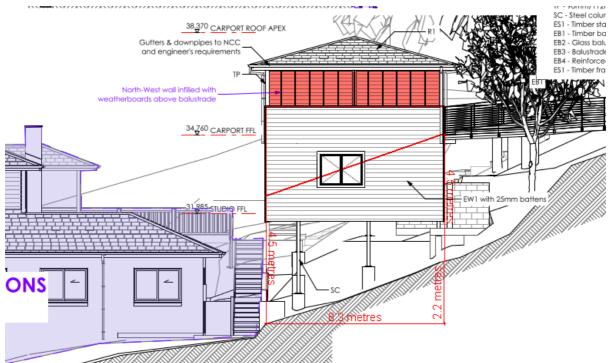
North-western elevation showing proposed envelope encroachment in red
